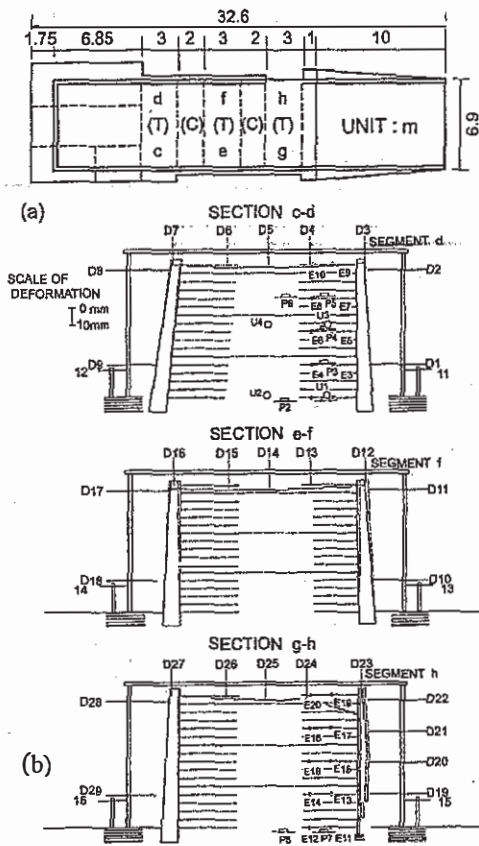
(a) Plan and (b) three sections of JR No.1 embankment (sand) (T; test section, and C; control section)
